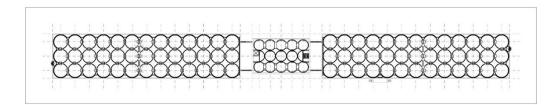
Plan drawing of the storage bins. The floor was not accessible (Author, 2021).
